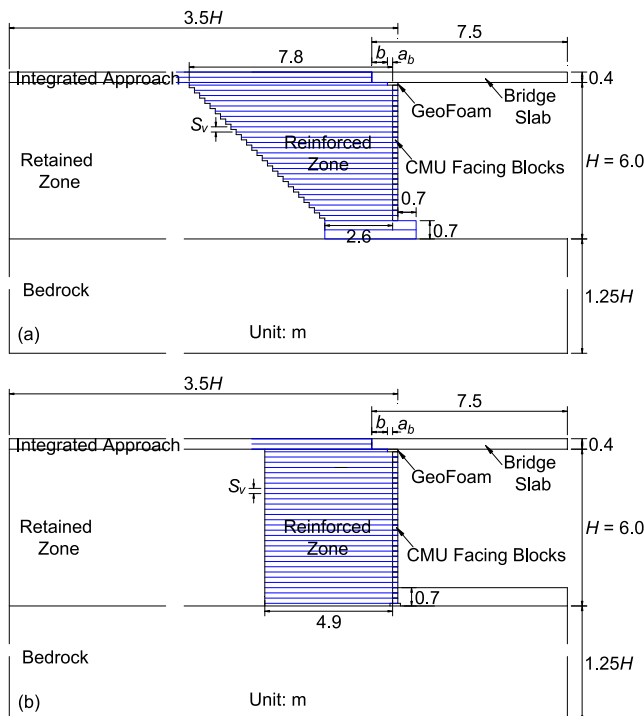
Geometries of numerical models considering different reinforcement layouts: (a) trapezoidal layout and (b) uniform layout.
